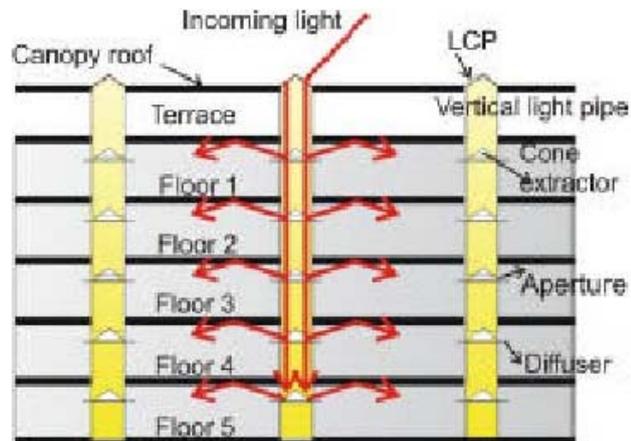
Vertical light pipe (Yeang, 2003)
